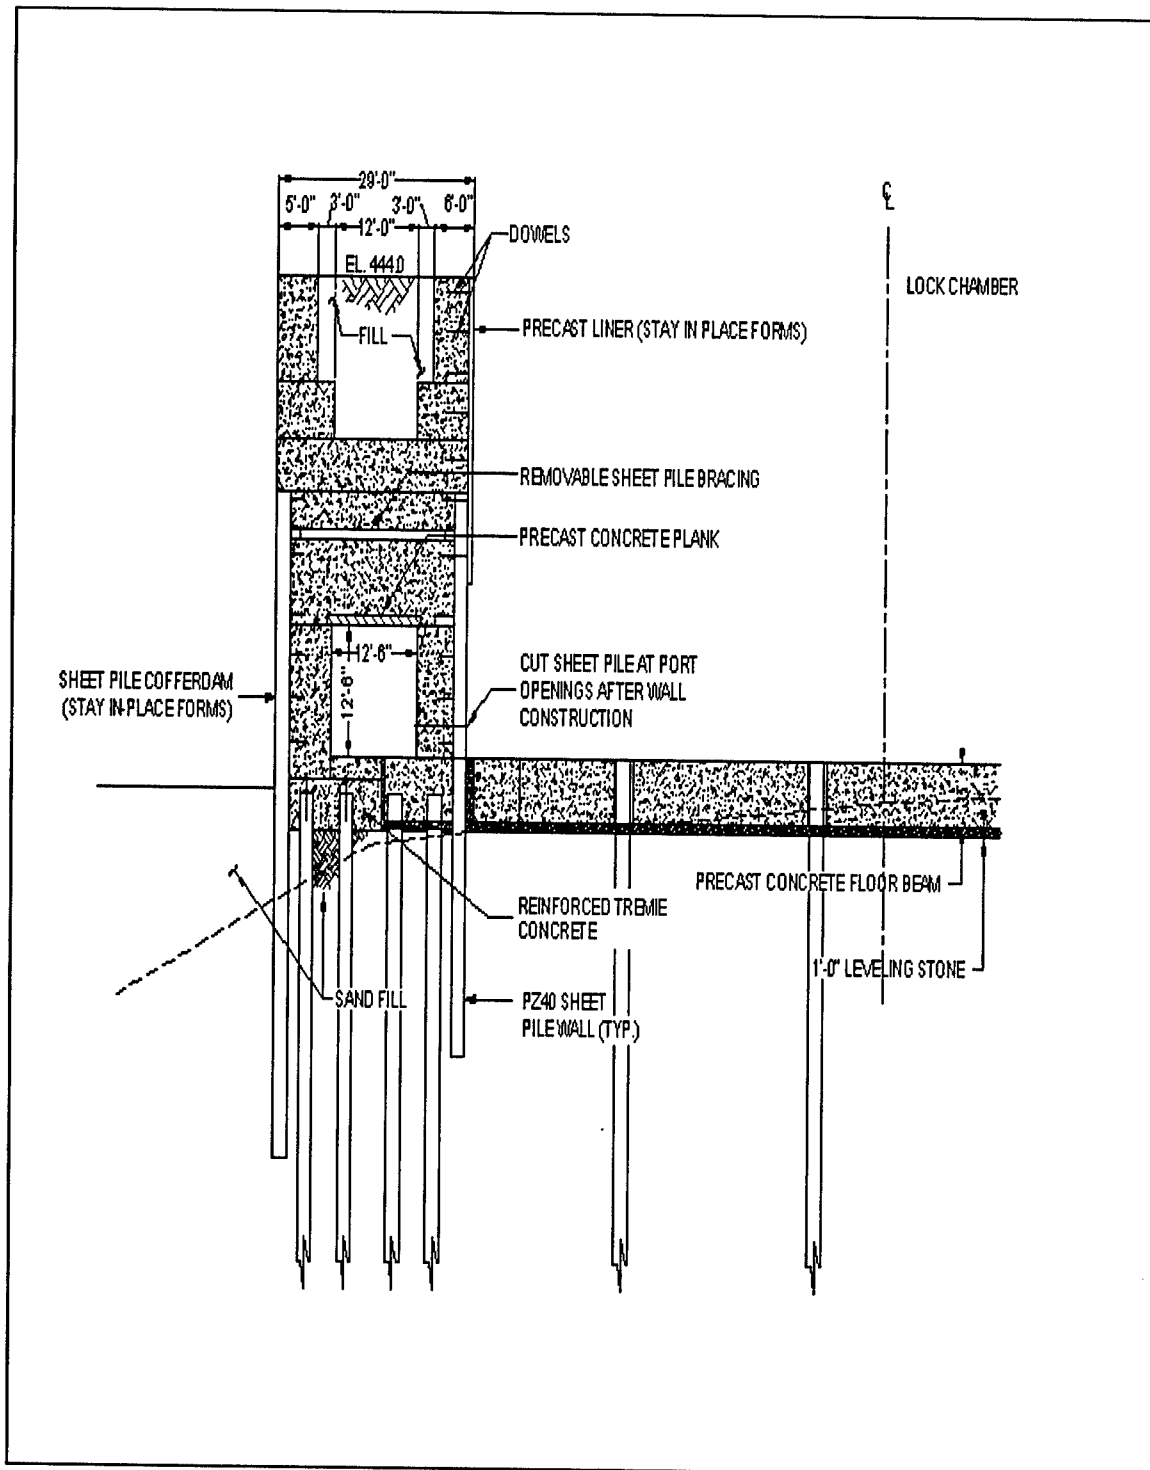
Plan 3, section showing interspersed precast concrete floor beams
